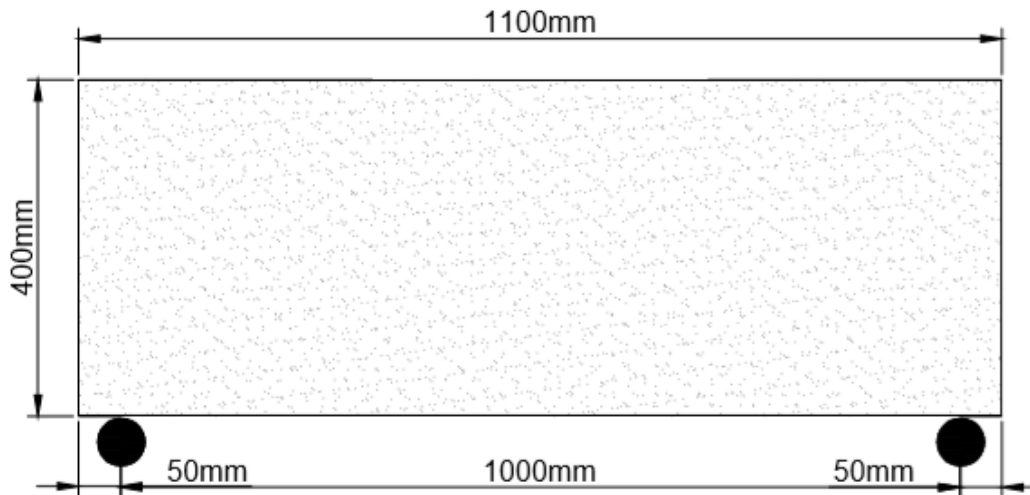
Details of reference specimen RN (all dimensions in mm)
